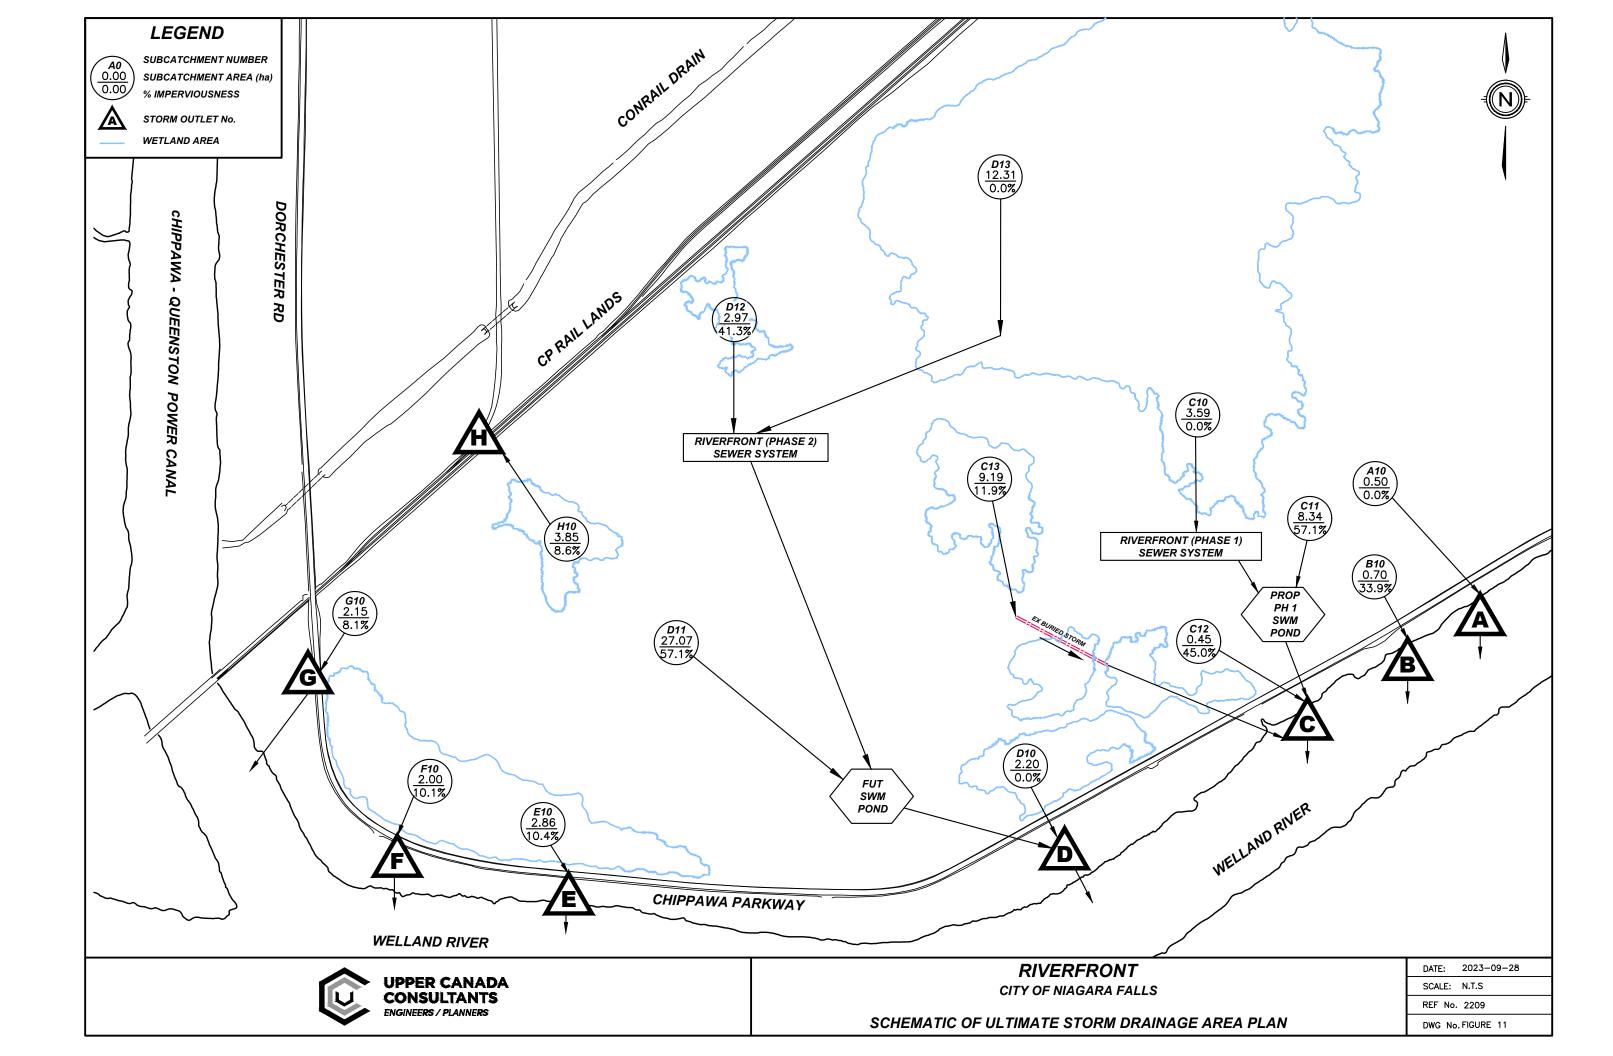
Schematic of Ultimate Storm Drainage Area Plan
